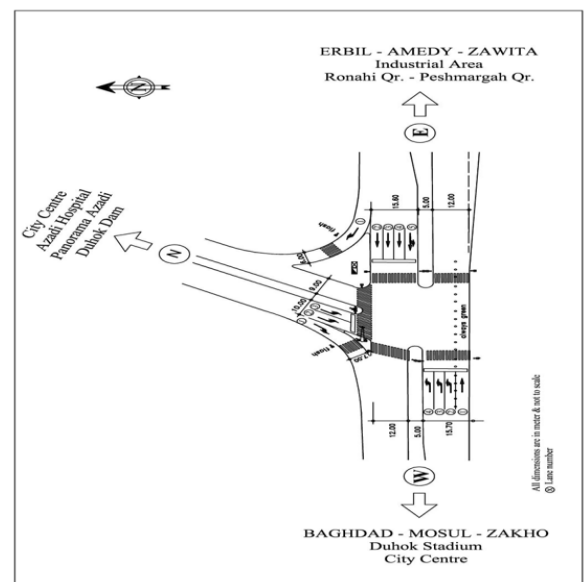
Silav Intersection (SIL) Plan (Directorate of Traffic, Duhok City, 2009)
